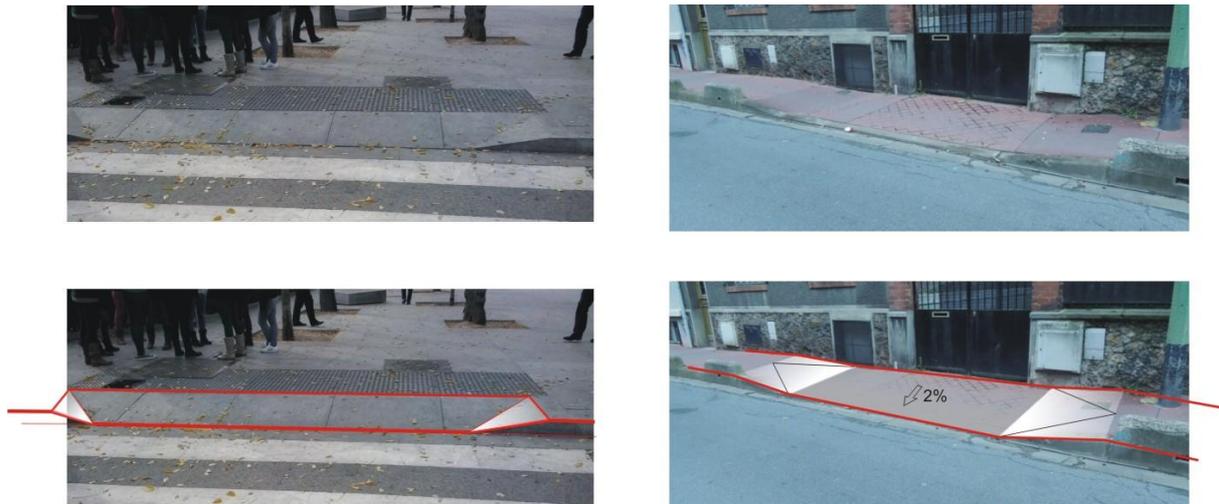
Perpendicular curb ramp (left) Parallel curb ramp (right) (Source and editing: O. Stepan)
